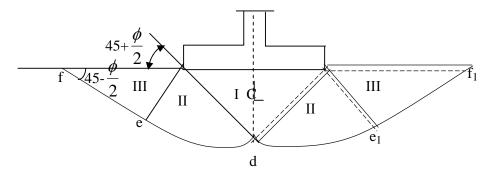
Failure zones below a footing with smooth base
